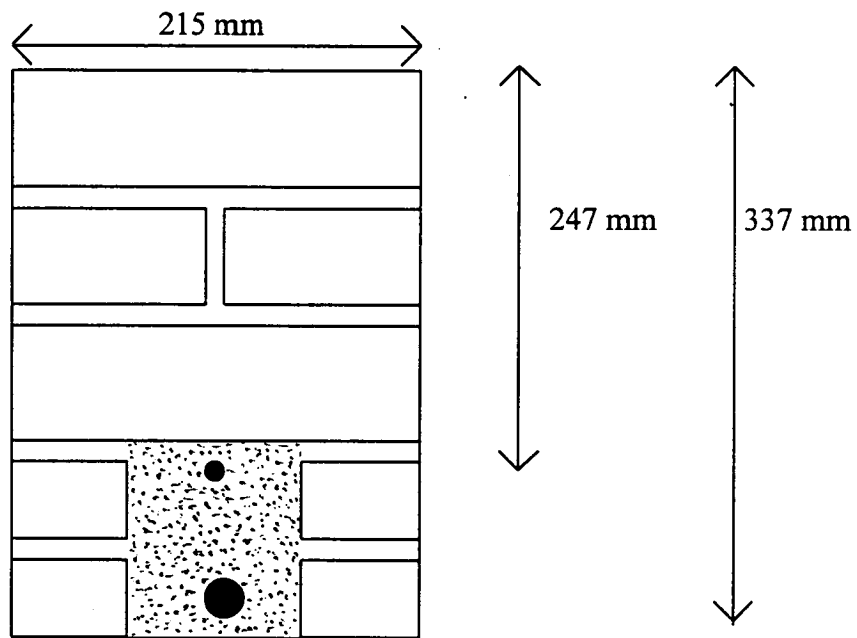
Walker's partially-prestressed brickwork section<sup>(13)</sup>.
